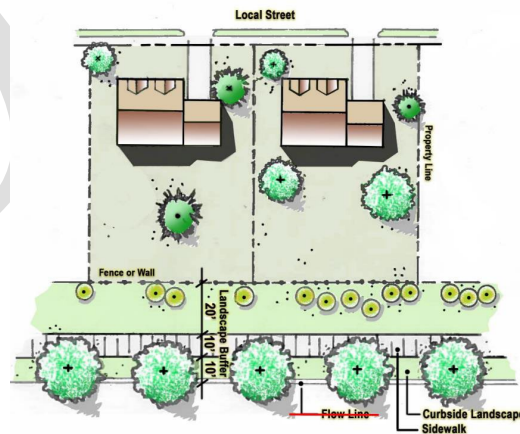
Arterial Street Frontage Buffer Measurement Detached Straight Walk
